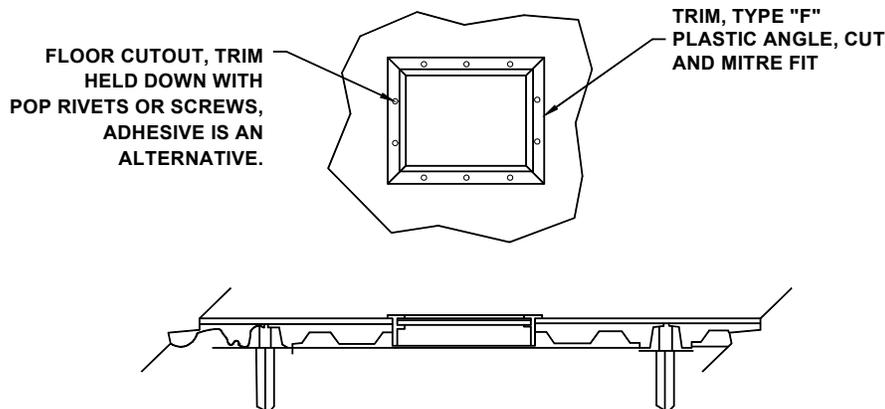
, Typical Raised Floor Tile Cut and Trim
